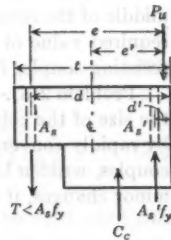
FORCES IN EQUILIBRIUM COMPRESSION FAILURE OF COLUMN
